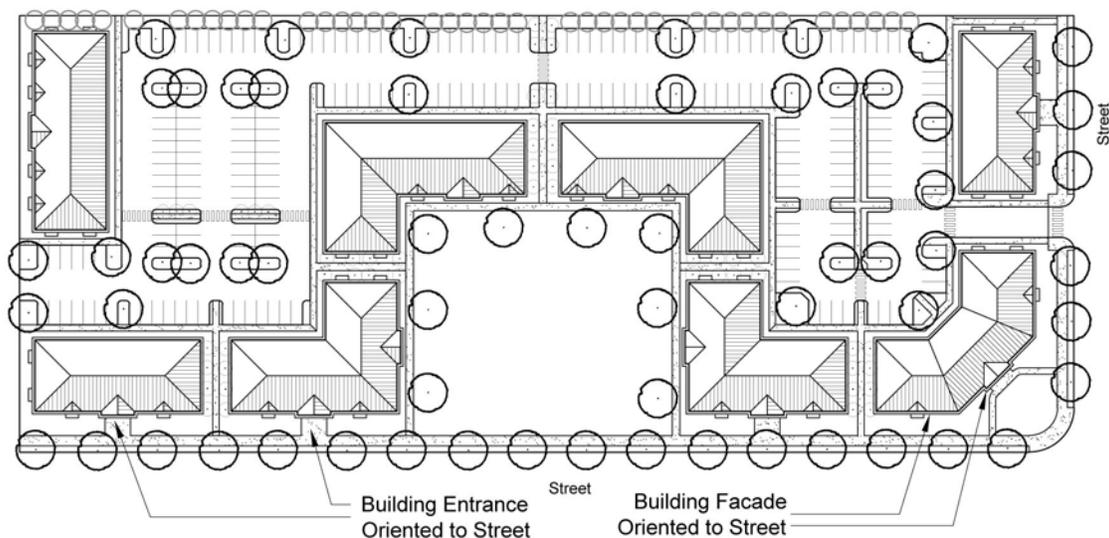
(b).4 – Site Layout – Building Orientation
